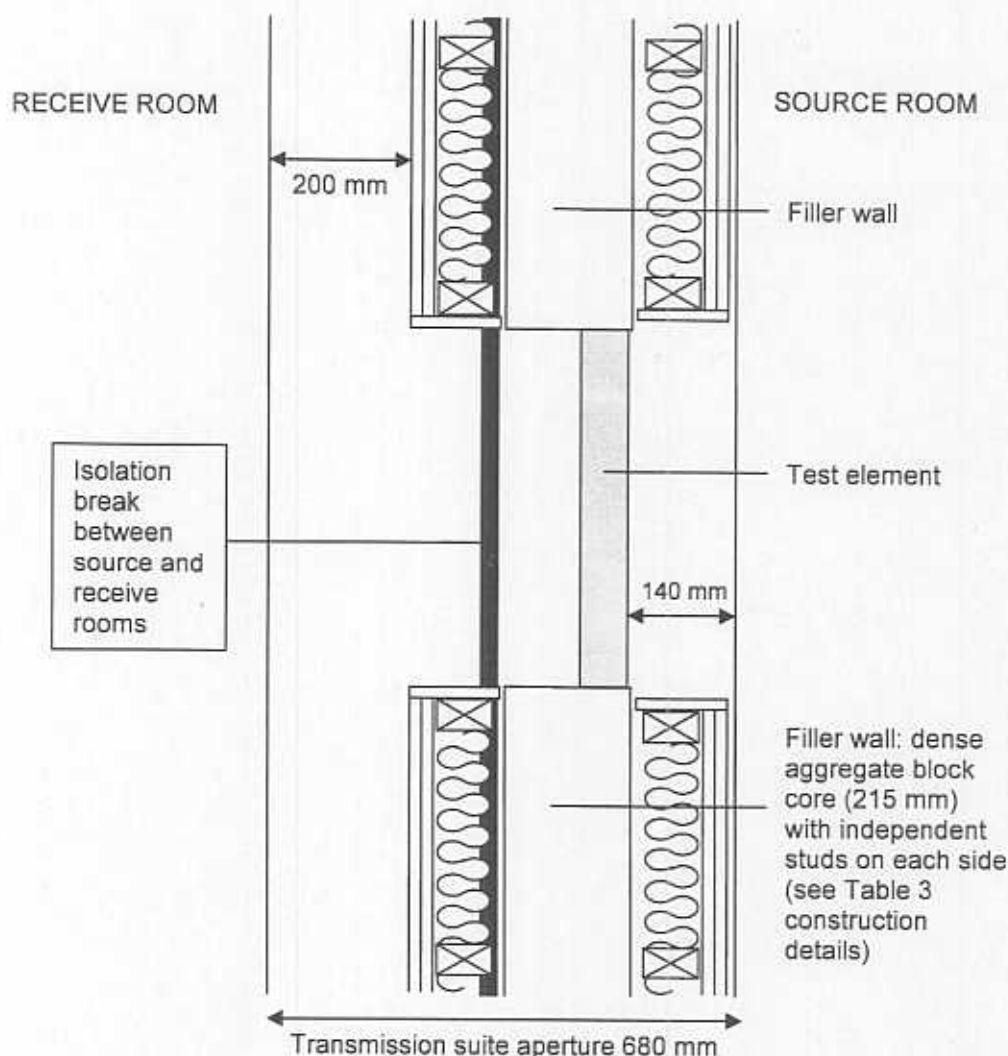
Plan view of the test construction and filler wall in the transmission suite aperture
